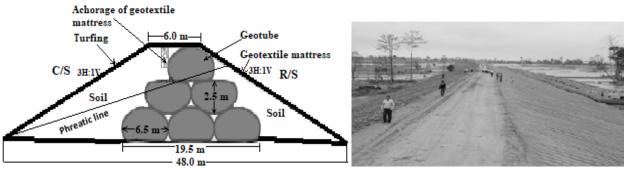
Use of geotubes as core of embankment in bank protection [10]
